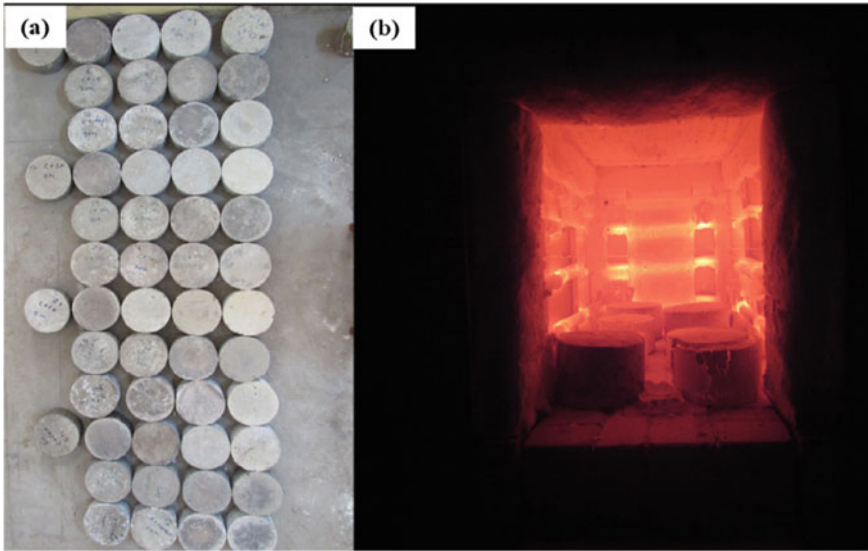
a View of the test specimens. b Heat test of specimen in computerised electrical furnace
